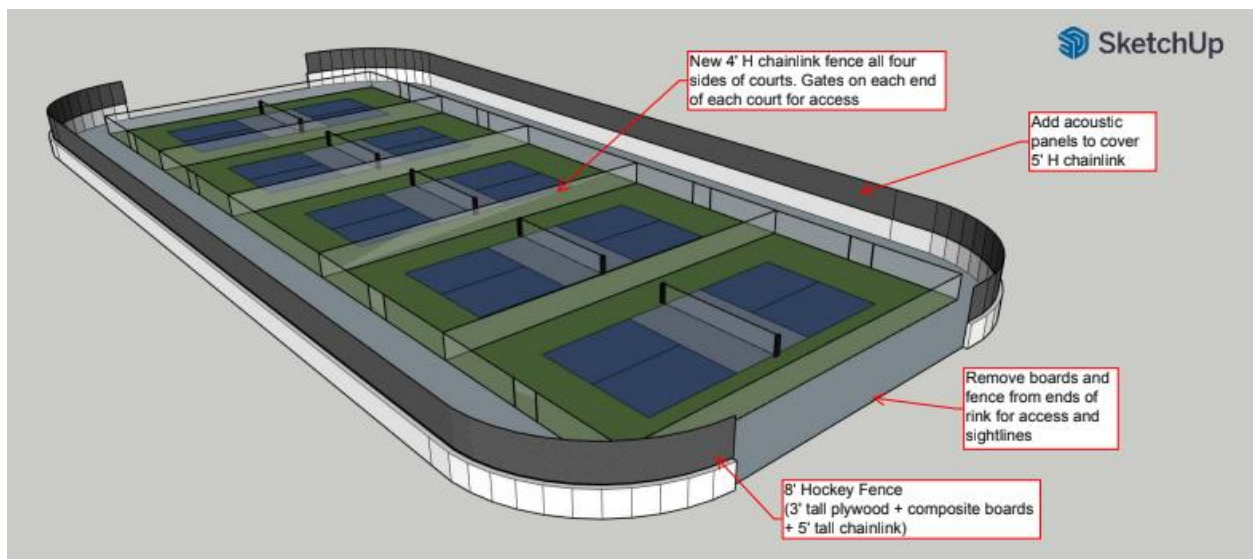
Proposed pickleball courts at Louisville Recreation Center
